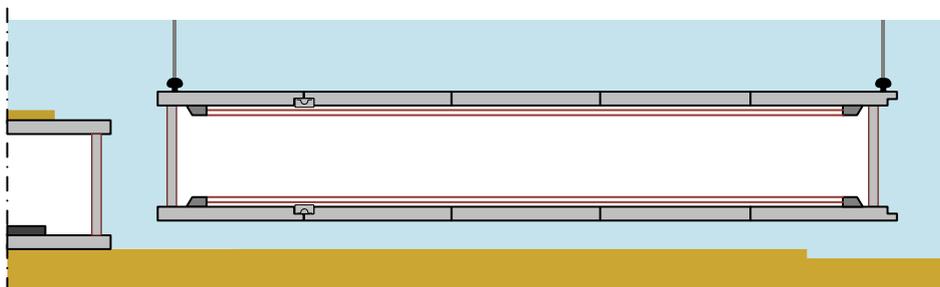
, LIFTING MULTIPLE ELEMENTS, INCLUDING PRESTRESSING; LONGITUDINAL VIEW
